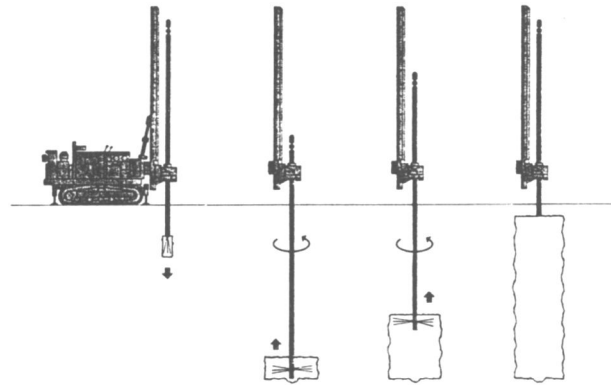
Installation method of consolidated soil columns by V.H.P.-grouting
